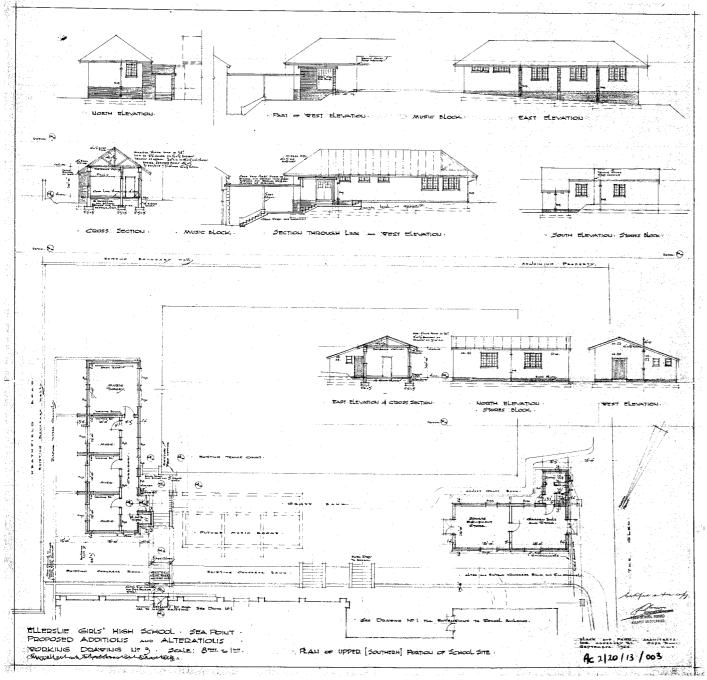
Music Room elevations, Black and Fagg Architects , 1964 (WCG Archive, 2023)
